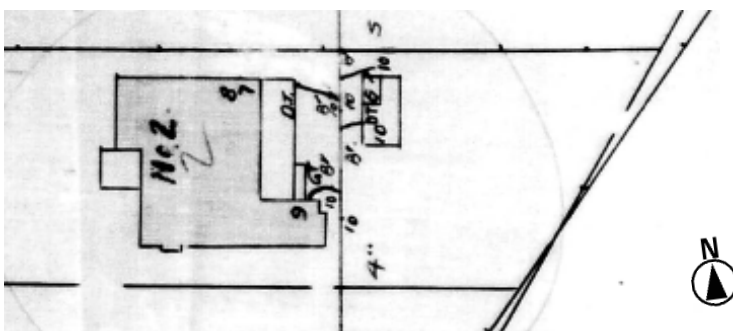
Drainage plan dated November 1927, showing a footprint of the house at 2 Astolat Avenue (Lot 7) (Source: SEW, Drainage Plan No. 154800)
